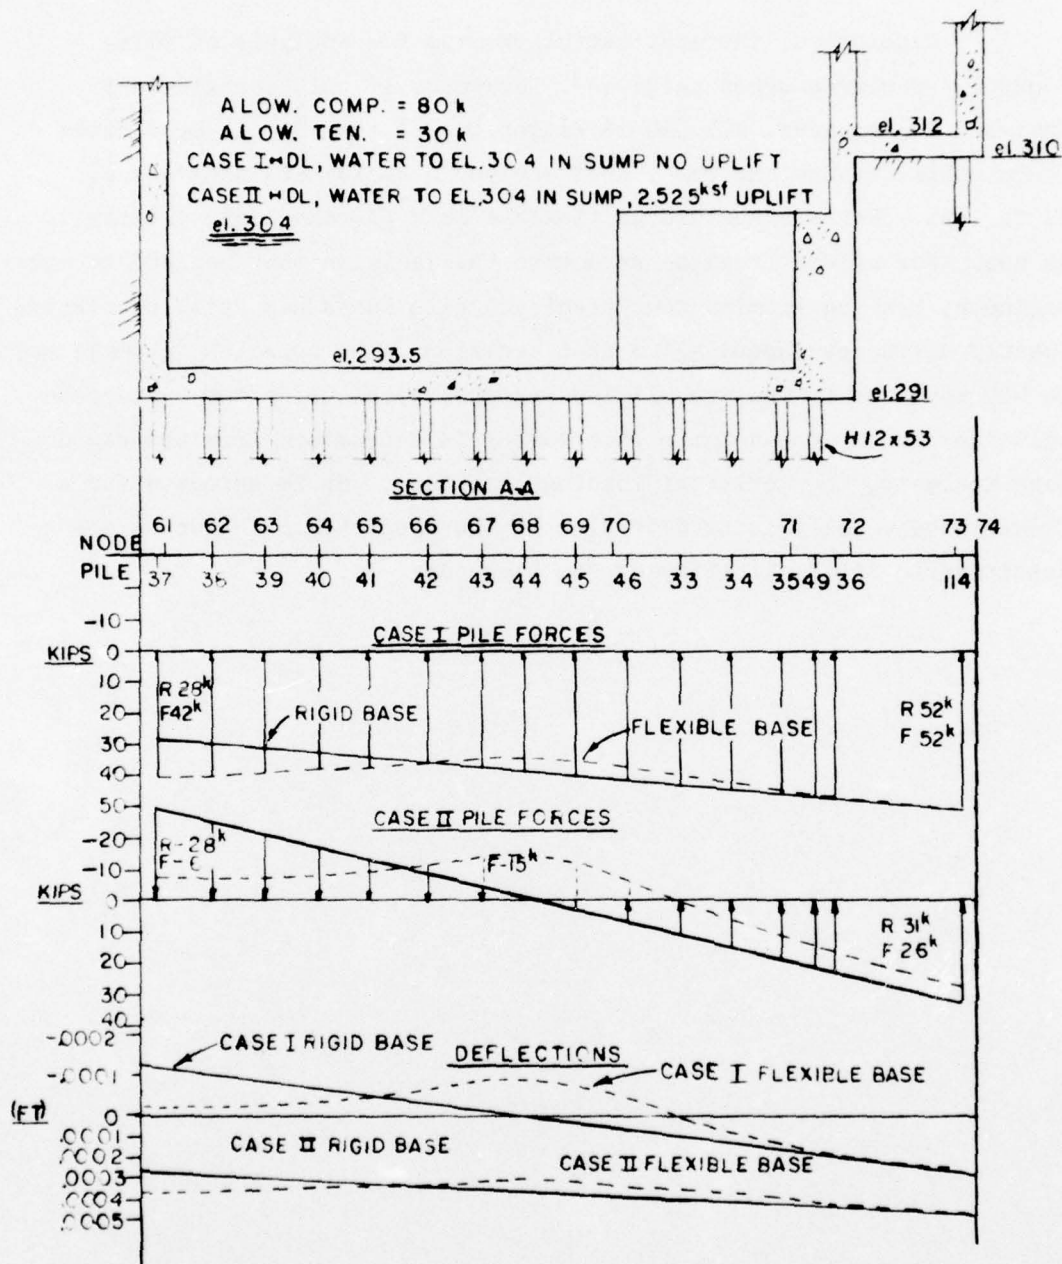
Results from rigid base and finite element matrix flexible base solution for pile-founded pump station
